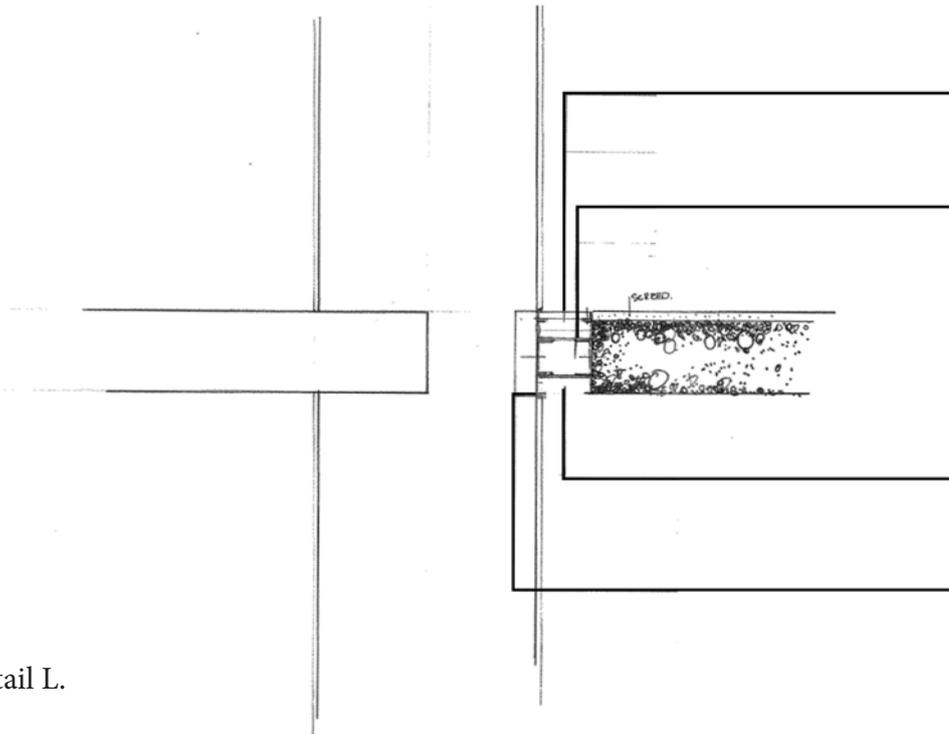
Junction between new roof and existing with new lintel (Author 2017)
